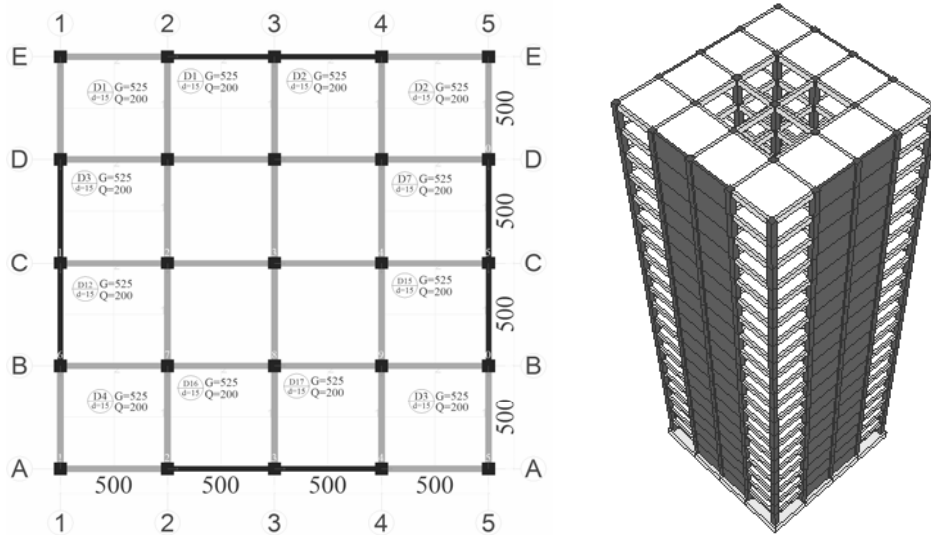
Structural plan and 3D view of parametric model IIIg
